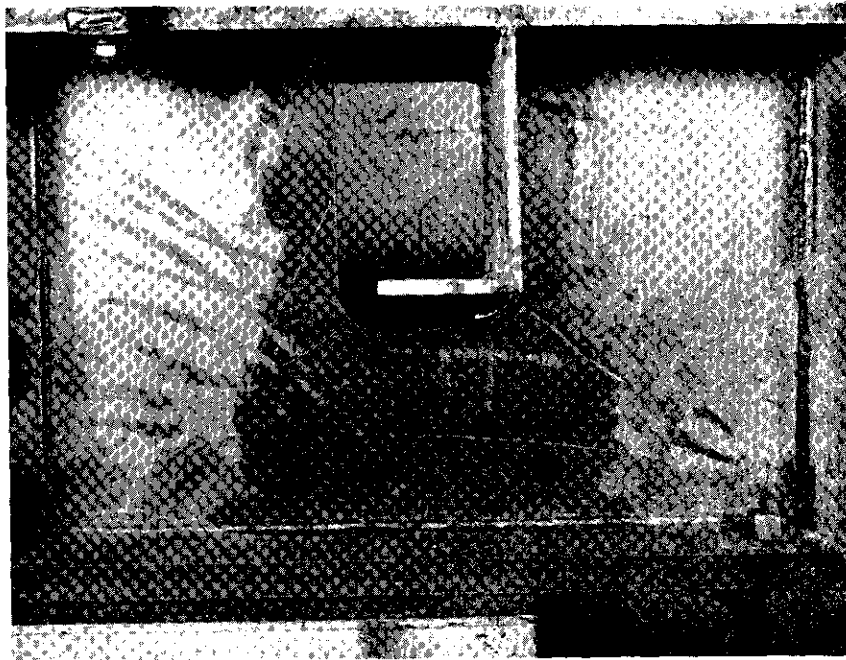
Fatigue Crack in Detail 51.
